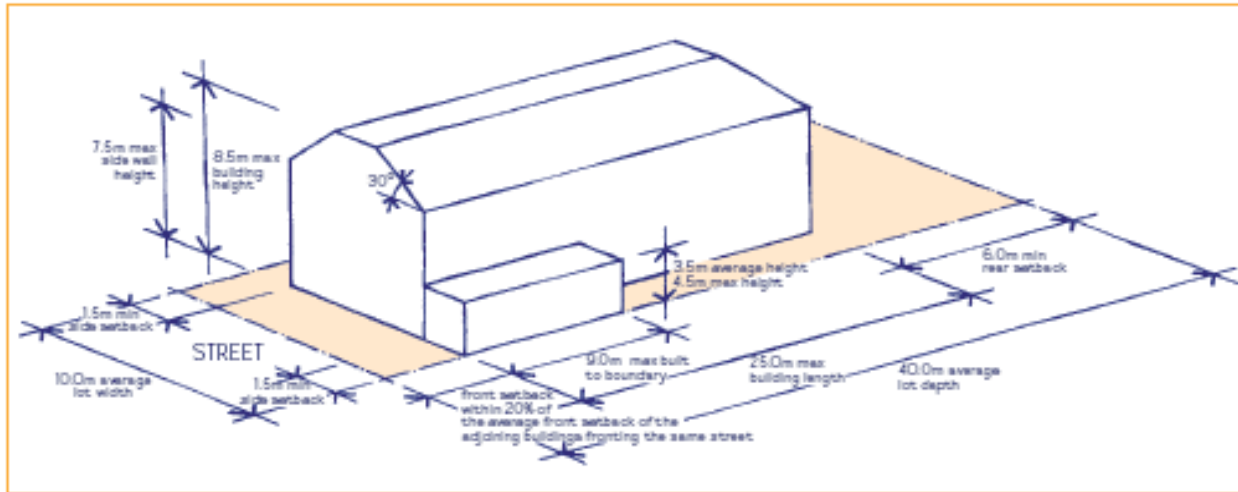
Building envelope for a typical 16 perch (405m²) lot with one street frontage
